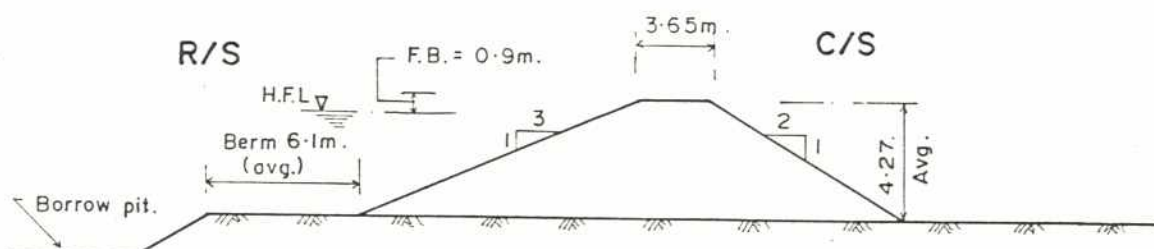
TYPICAL EMBANKMENT SECTION OF
